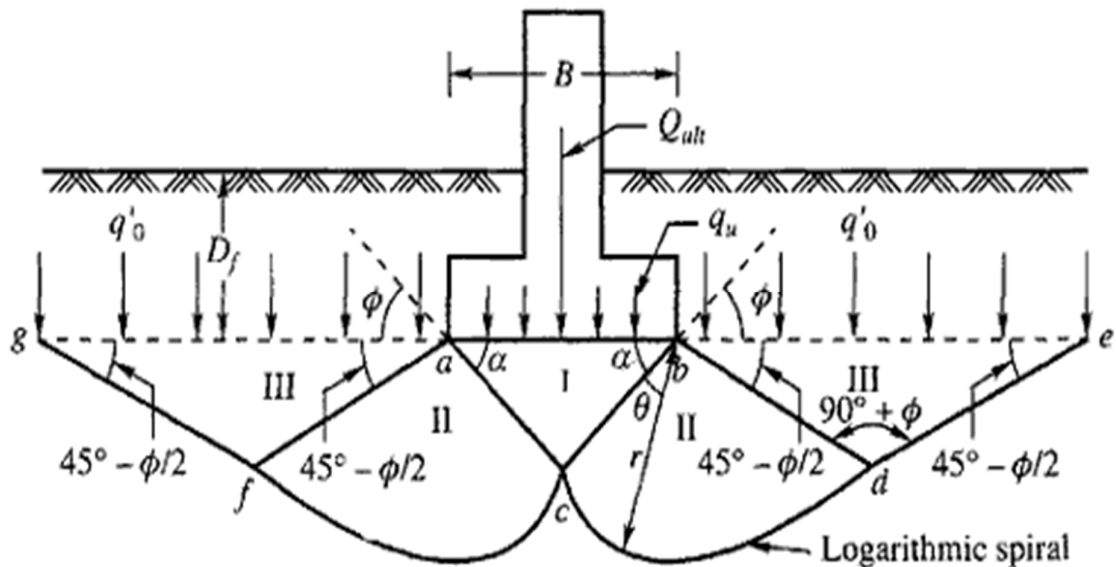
General shear failure surface as assumed by Terzaghi for a strip footing
